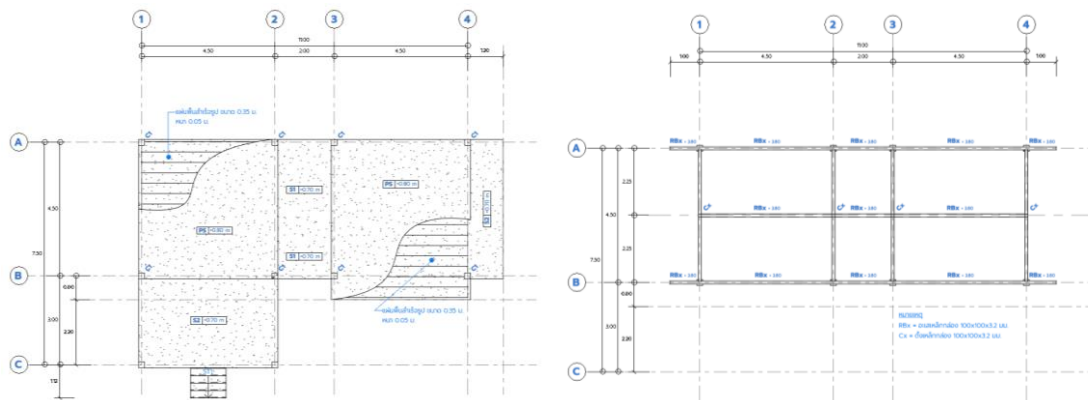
Floor Structure Plan and Roof Beam Structure Plan, 2D Construction Drawing
